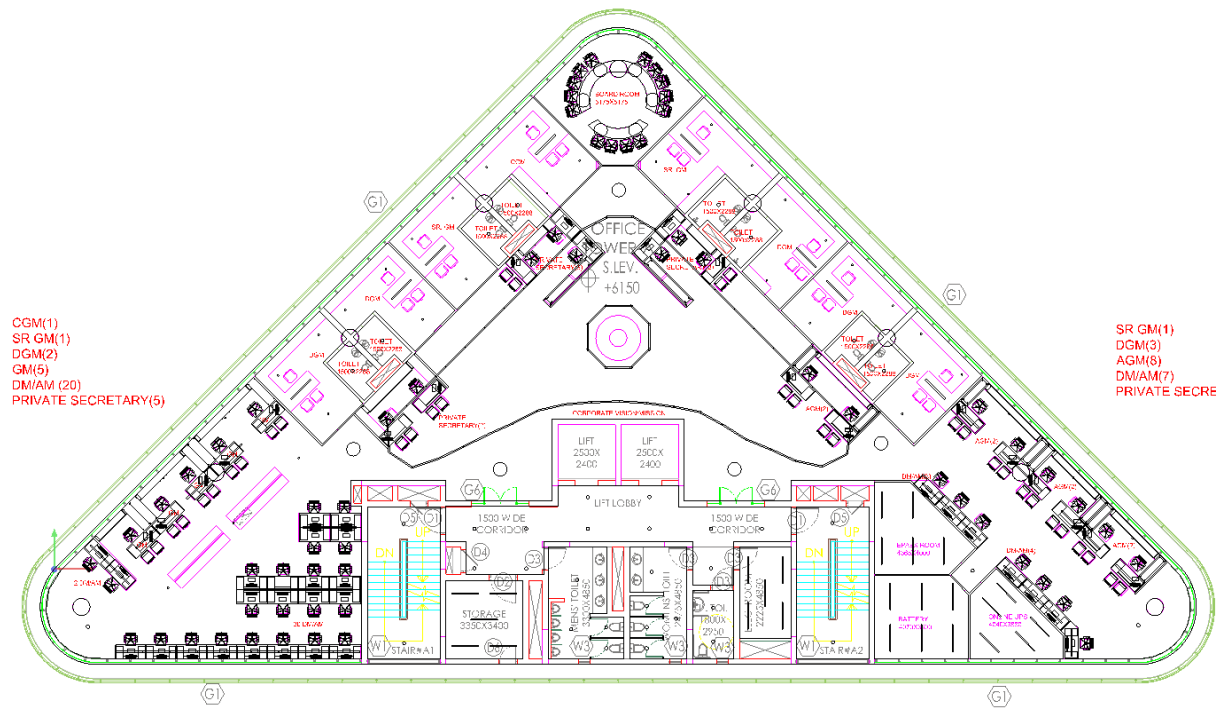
AutoCAD layout for First Floor of GRIDCO Building
